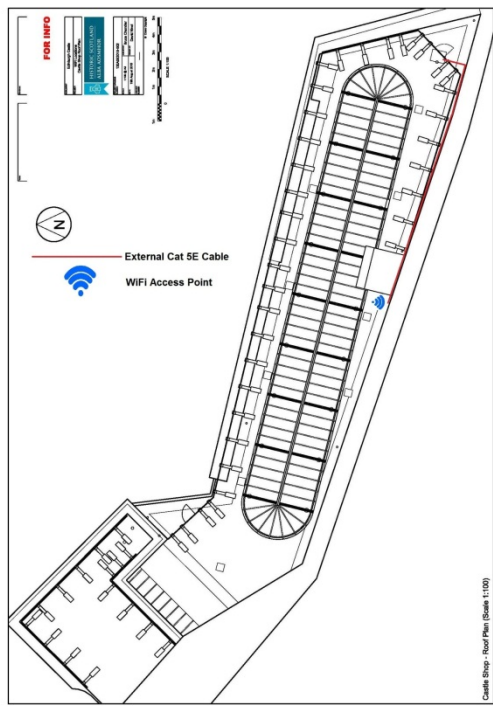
Edinburgh Castle Gift Shop roof showing proposed antenna access point mount and cable run
